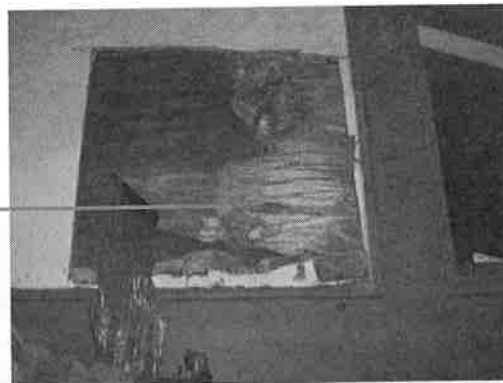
Below Deterioration at Northwest Corner of Sloped roof
